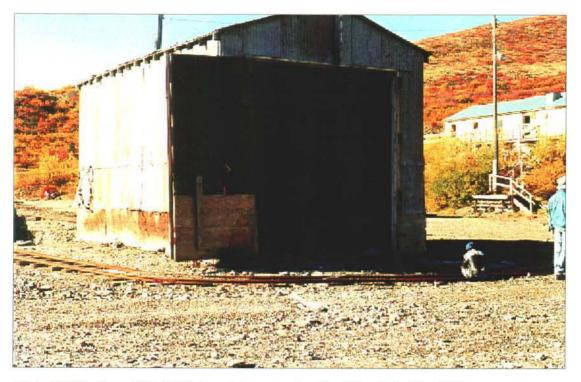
Keno 700. Vehicle maintenance shed (building 6) looking S.W.
